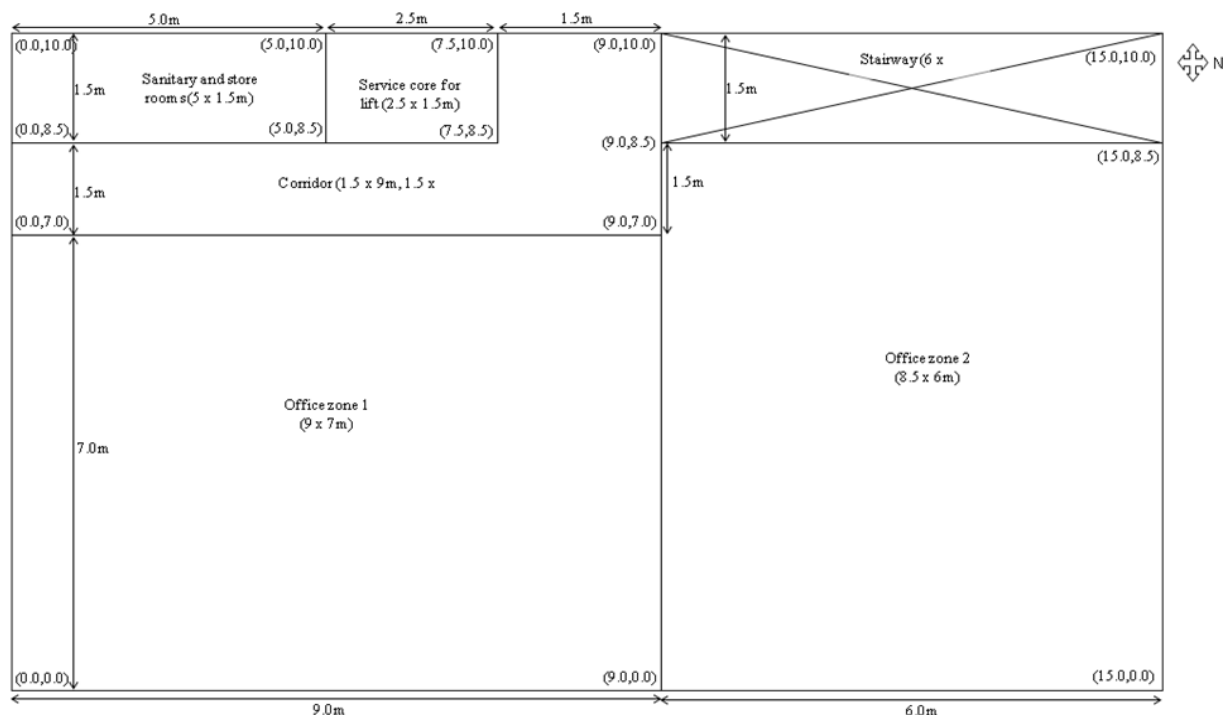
Schematic layout plan of the low-rise office building from the ground floor to the 3<sup>rd</sup> floor, with grid points
